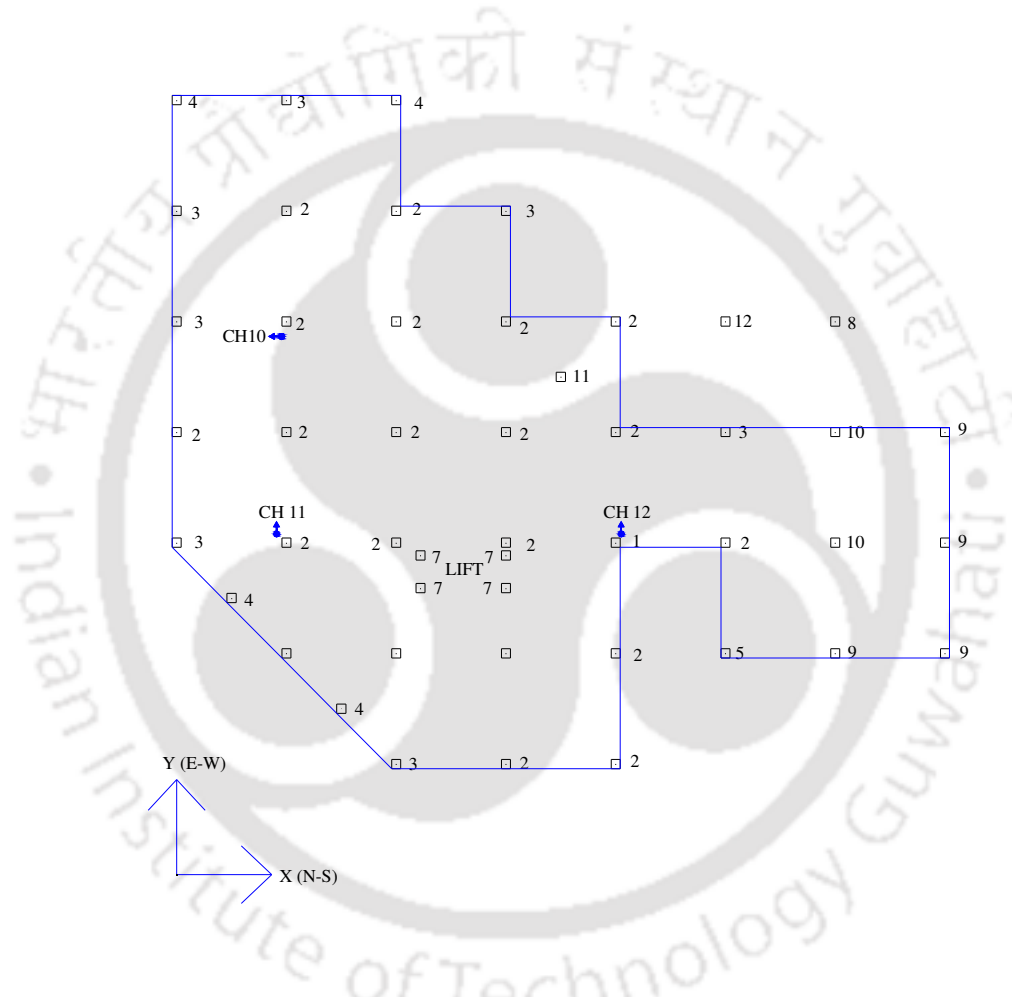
Plan showing column position and sensor location in the second floor of torsionally coupled sample building
